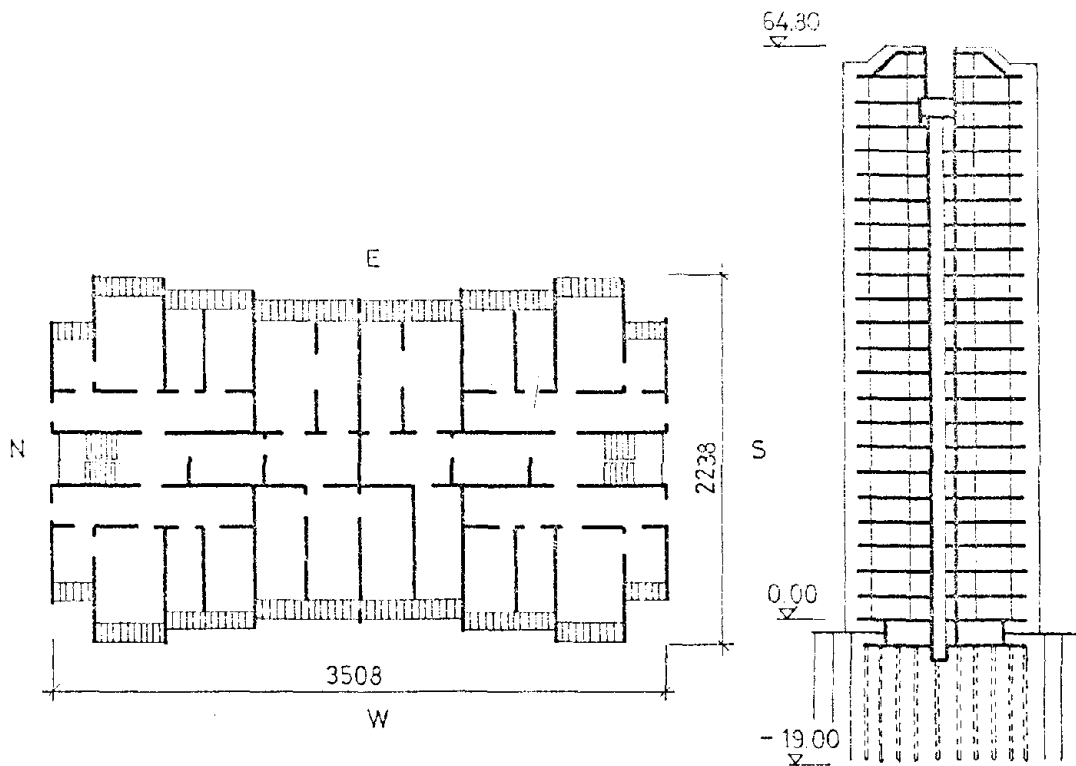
TYPICAL PLAN AND CROSS SECTION OF THE TWENTYTWO-STOREY BUILDING
